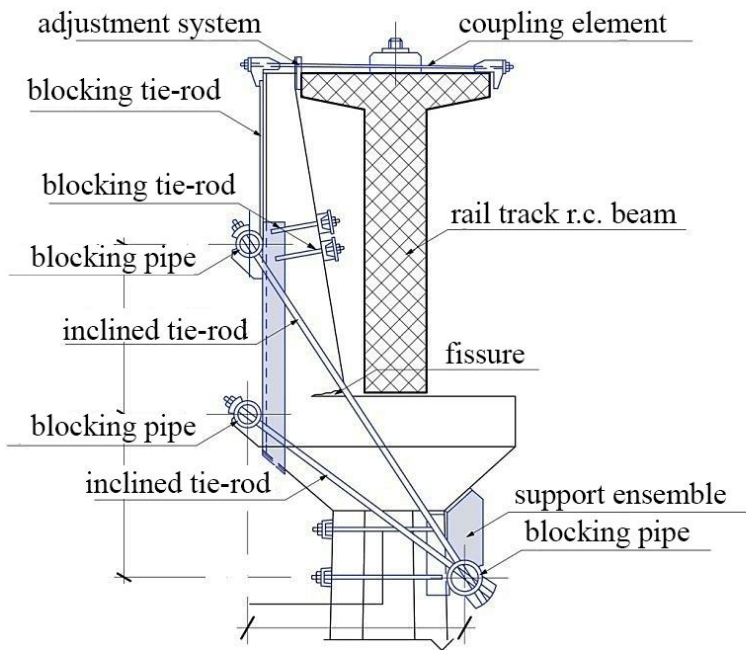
Reinforced concrete cantilever consolidation for fixing rolling track beam – passive tie-rods system.
